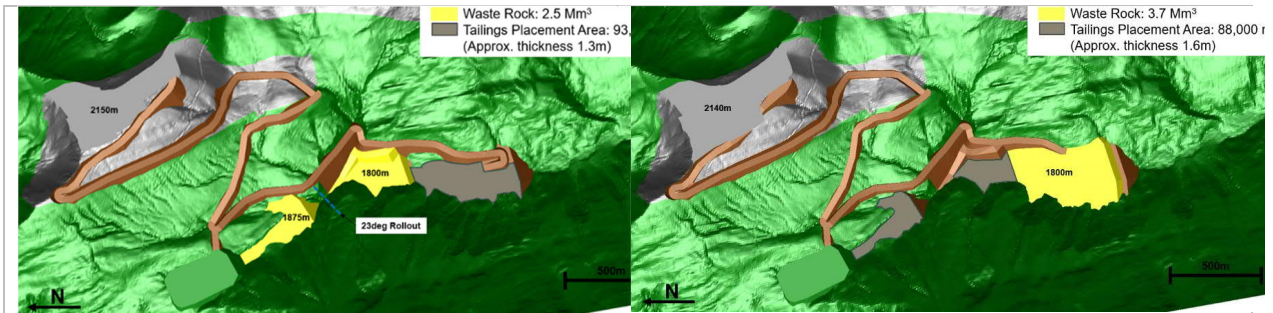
Reject Layering Approximately Y1Q1 (lower left) and Q2 (lower right)
